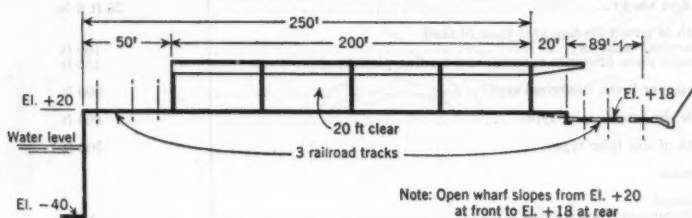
SECTION OF WHARF AND SHED, MARGINAL-WHARF PLAN
